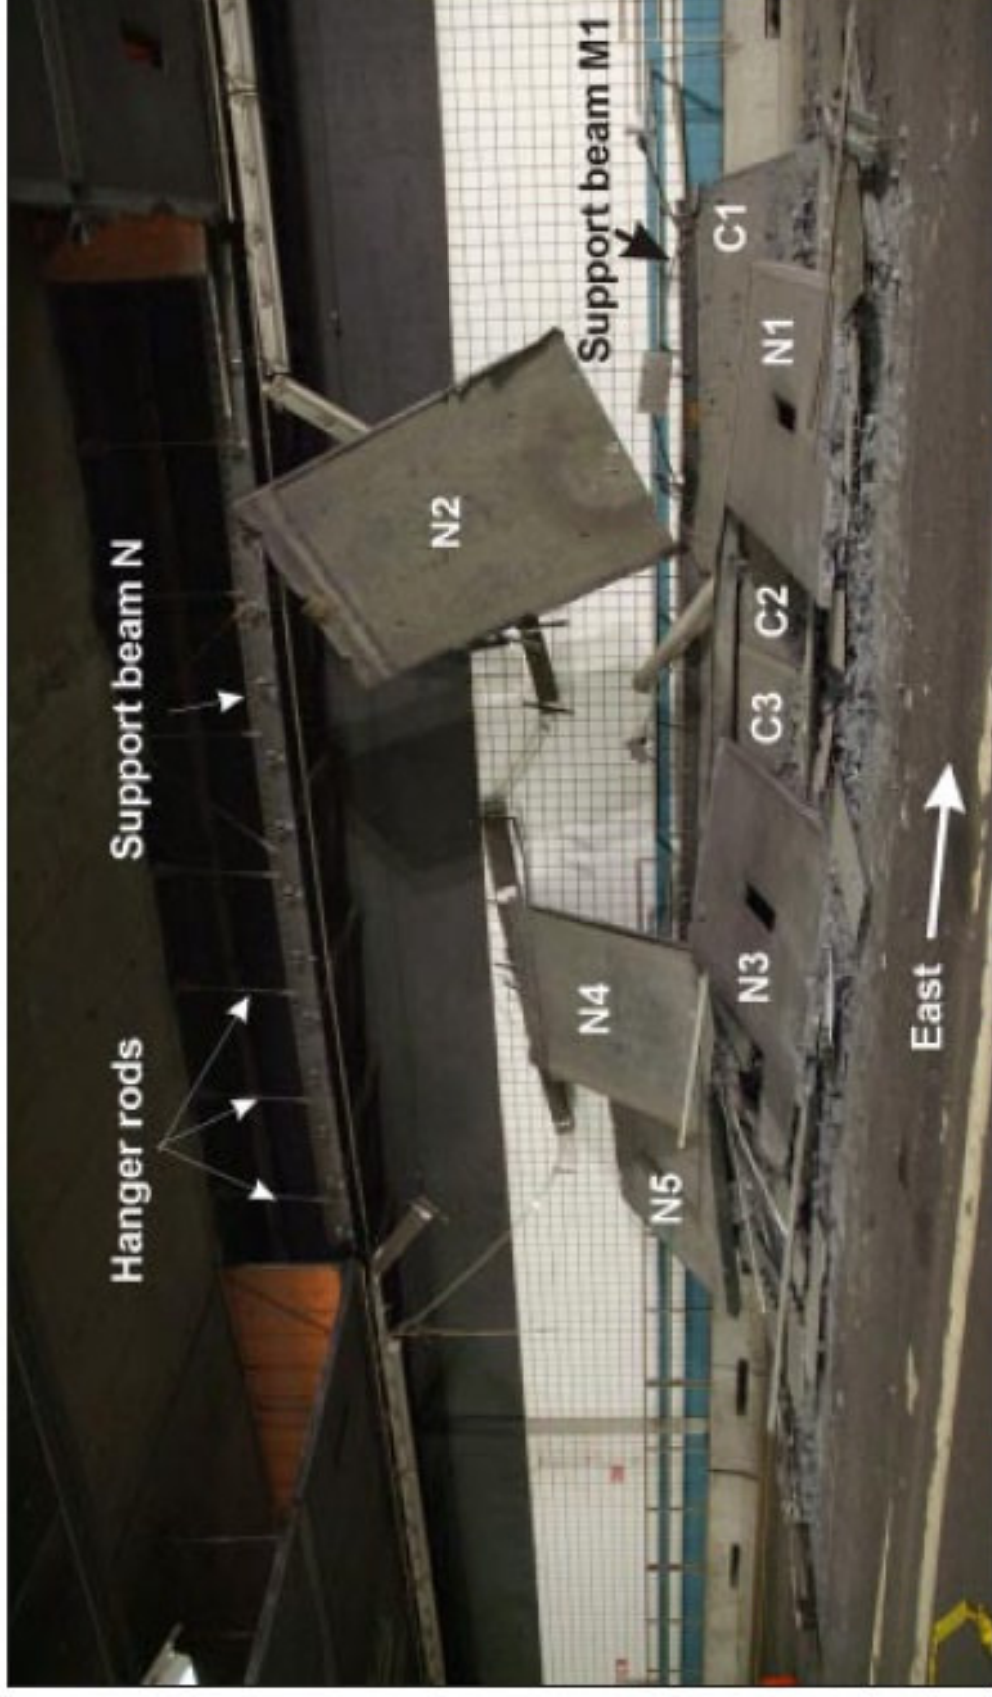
Looking north at the collapsed concrete panels before removal from the tunnel. Components shown as labeled for postaccident reconstruction. (Photograph courtesy Massachusetts State Police)
